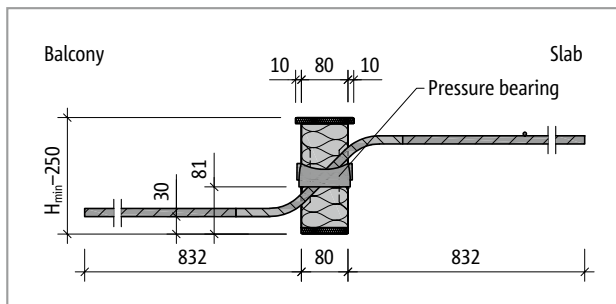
Schöck Isokorb® T type Q-V12: Product section
